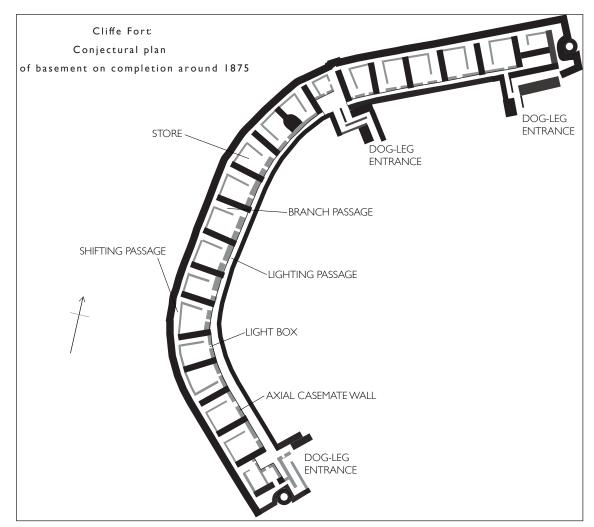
Conjectural plan of the basement as it would have appeared on the completion of construction work in 1875, based on the 1899 plan (TNA: WO78/4963; App Fig 1) and examination of the basement fabric (Not to scale).
